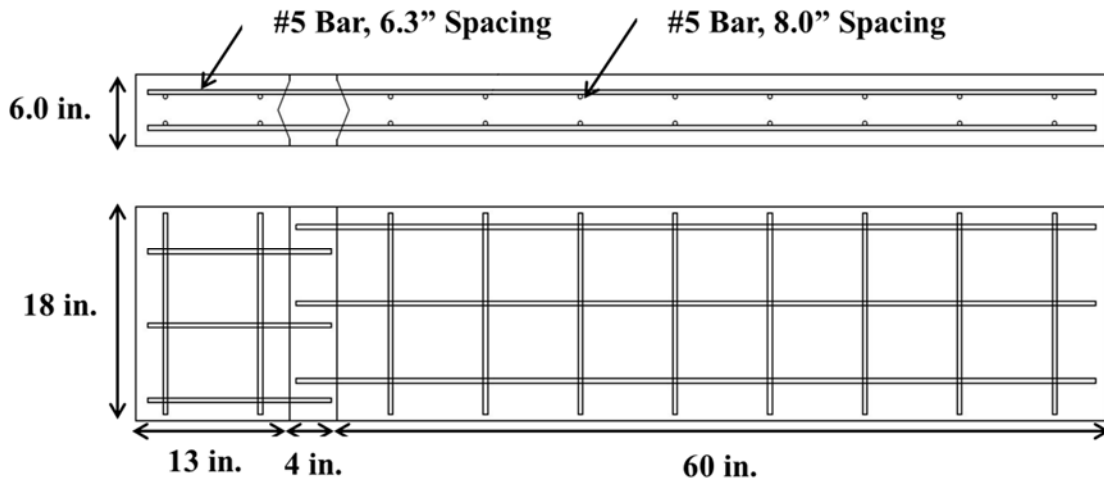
shows the reinforcement and joint details for the specimens studied. For the pure flexure tests, each precast deck element measures 60" (1500 mm) in length, 18" (457 mm) wide and 6" (150 mm) deep. Joint lengths vary between 4", 6" and 8" (100, 150 and 200 mm). Longitudinal reinforcement is spaced at 6.3" (160 mm) along the width of the deck. Transverse reinforcement is spaced at 7.8" (200 mm) along the length of the deck. Reinforcement at the lower layer is placed at a depth of 3.5" (89 mm) and 1.5" (39 mm) for the upper layer.
